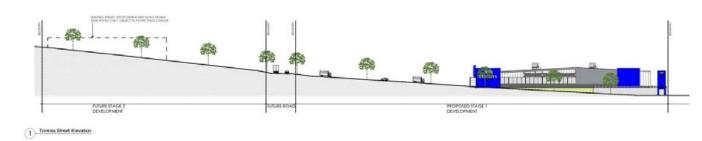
Street view of Stage1- Masters Homemaker Improvement Centre and future Stage 2.
